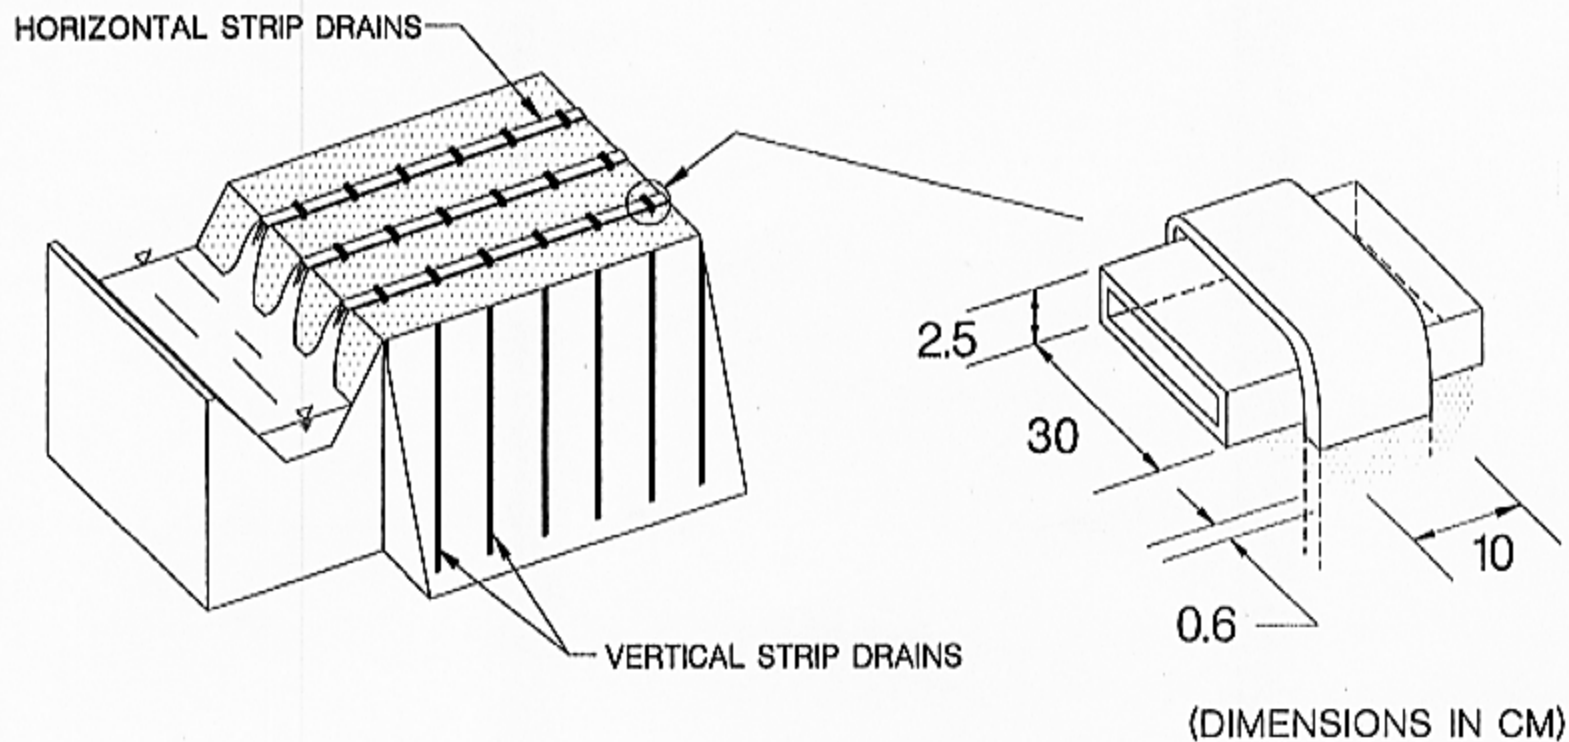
Horizontal and Vertical Strip Drain Installation In Mobility Test Section at Craney Island
